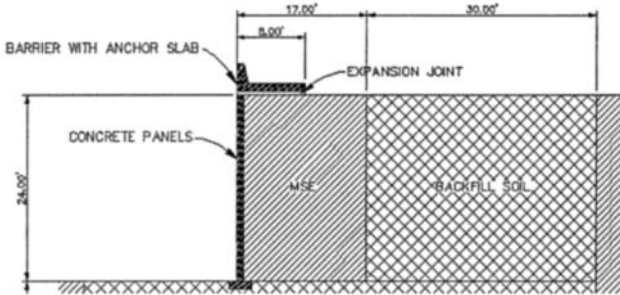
Model B---Concrete Barrier with Concrete Anchor Slab
